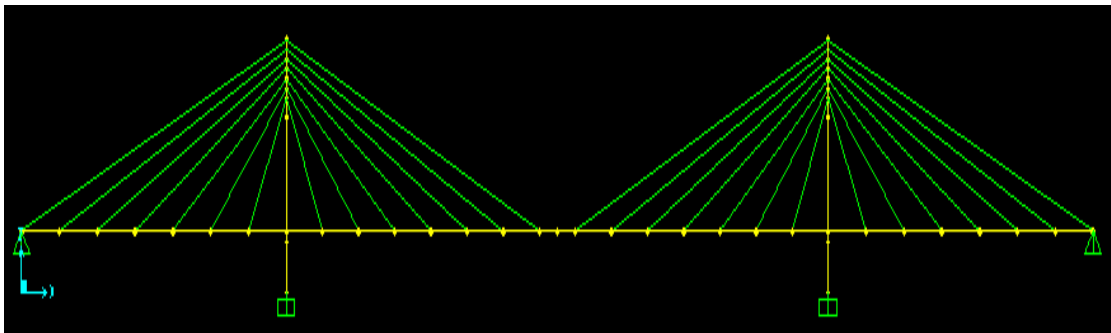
Longitudinal view of modeled cable-stayed bridge
